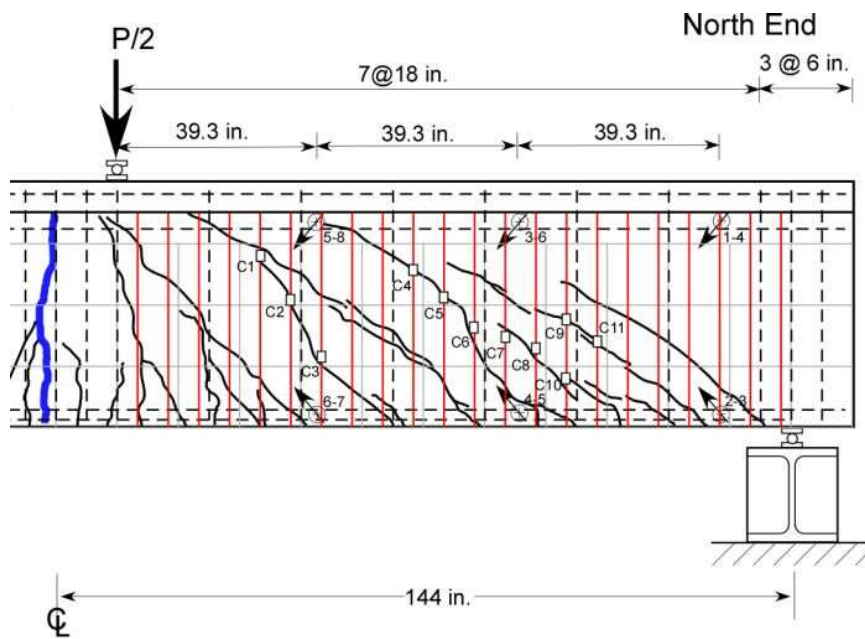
Specimen T.6.18.6.S crack map (failure test)
